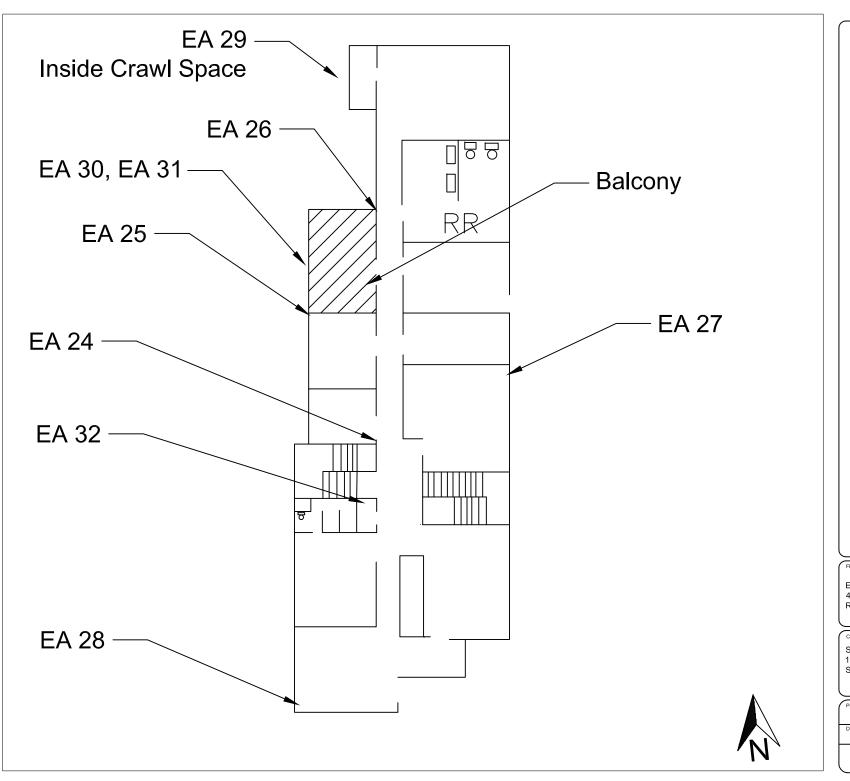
Sample Locations East House Floor 2 2019 14th Street Santa Monica, CA 90405
